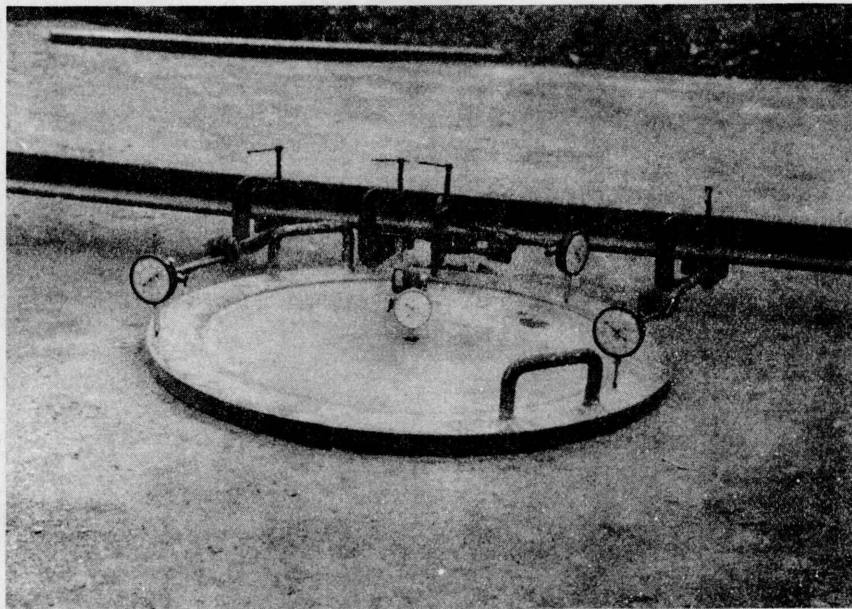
SET UP OF PLATE AND EXTENSOMETER DIALS FOR PLATE BEARING TESTS.
